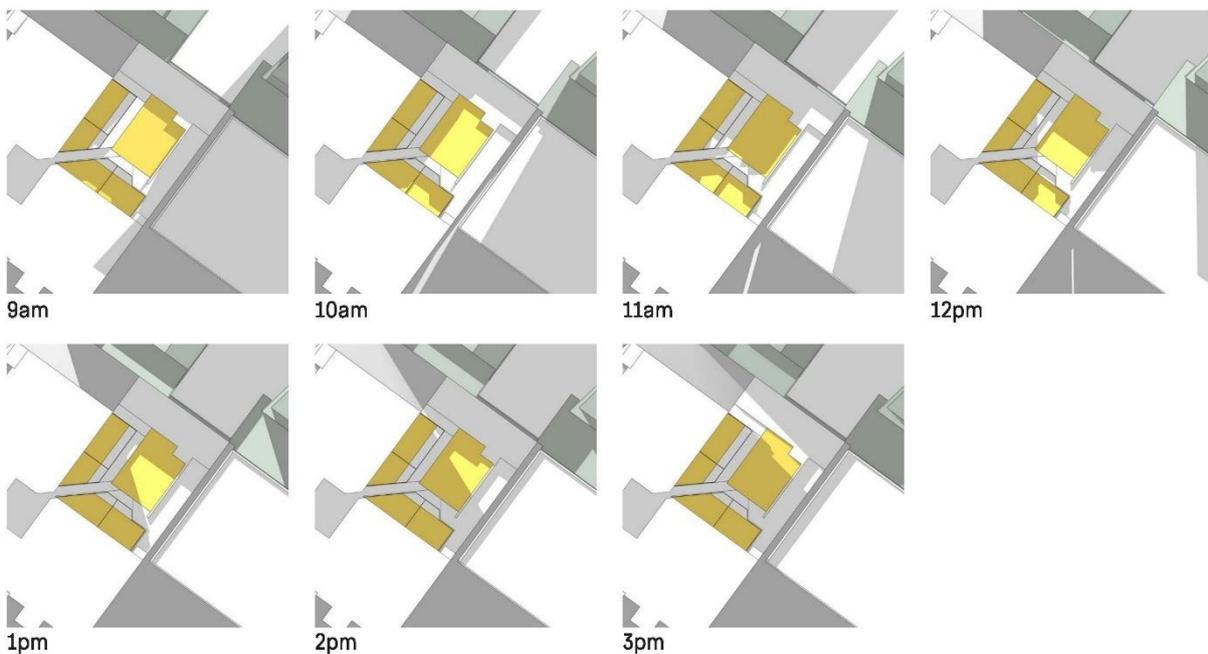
Overshadowing plans showing solar access compliance to adjoining communal open space
